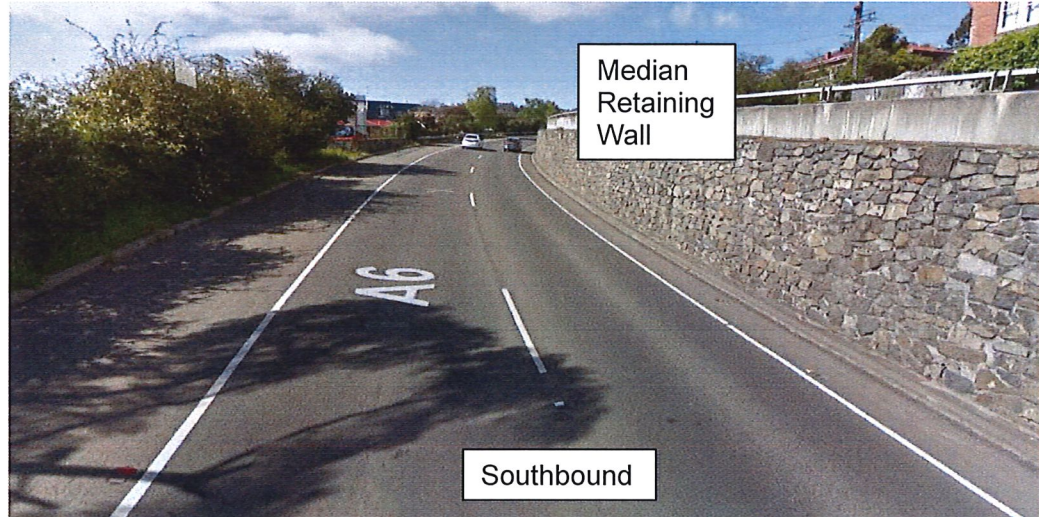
Southbound Carriageway illustrating wall and shoulder
